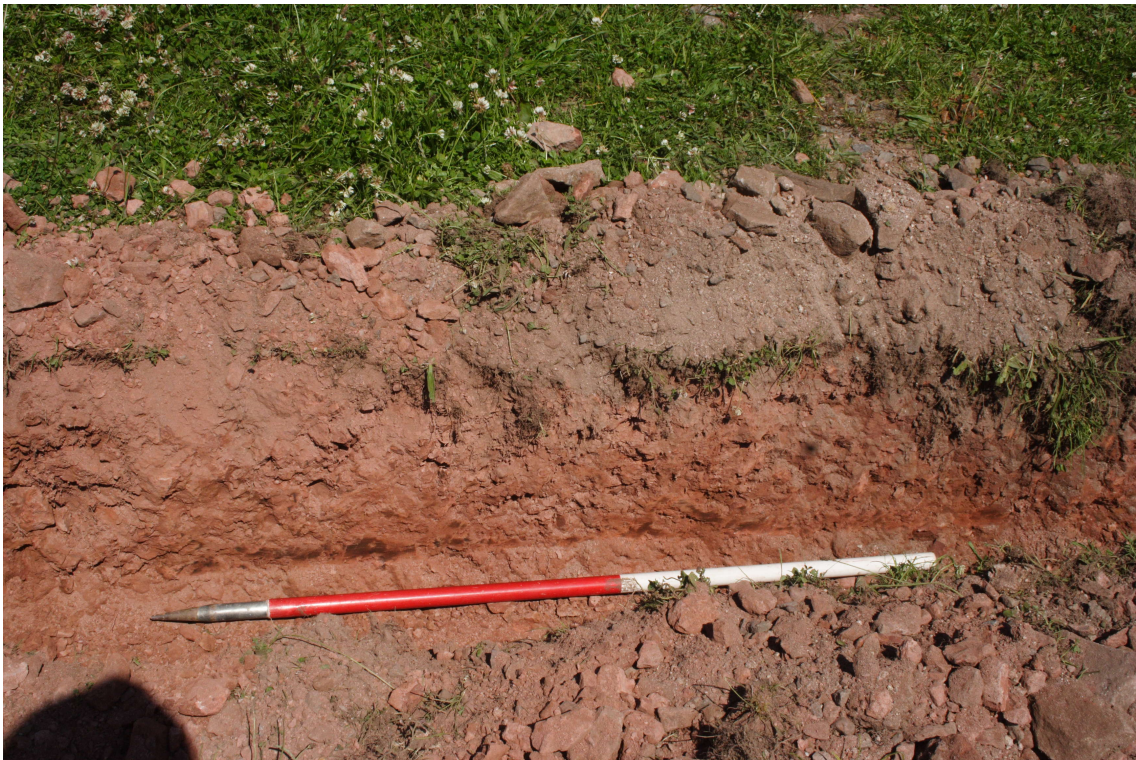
Section through east-west drainage trench showing thin depth of topsoil and undisturbed rab beneath
